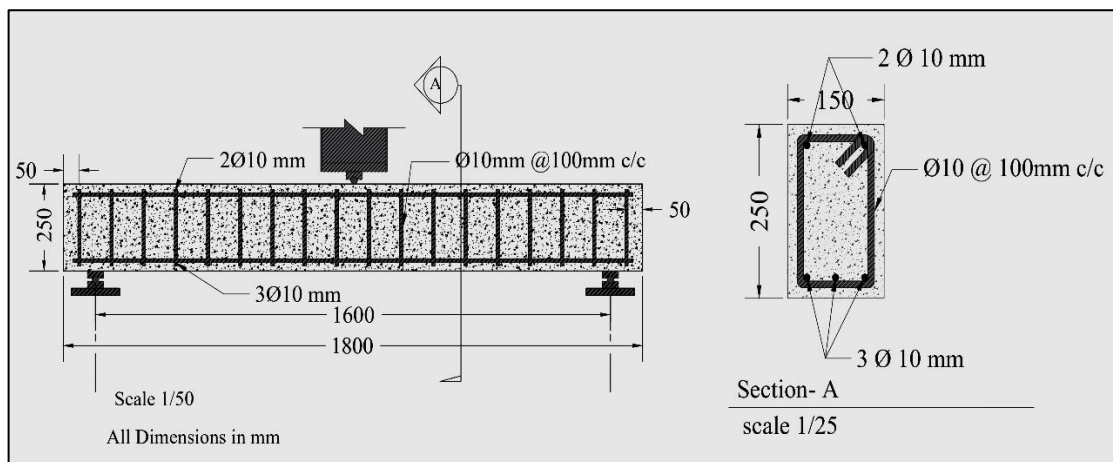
Longitudinal and Cross Section Details of the Beam
